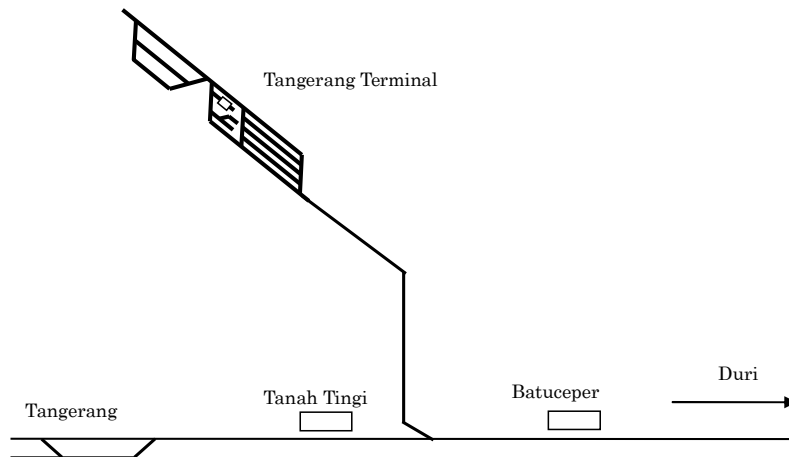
Track Layout (Railway Access to Tangerang New Terminal)
